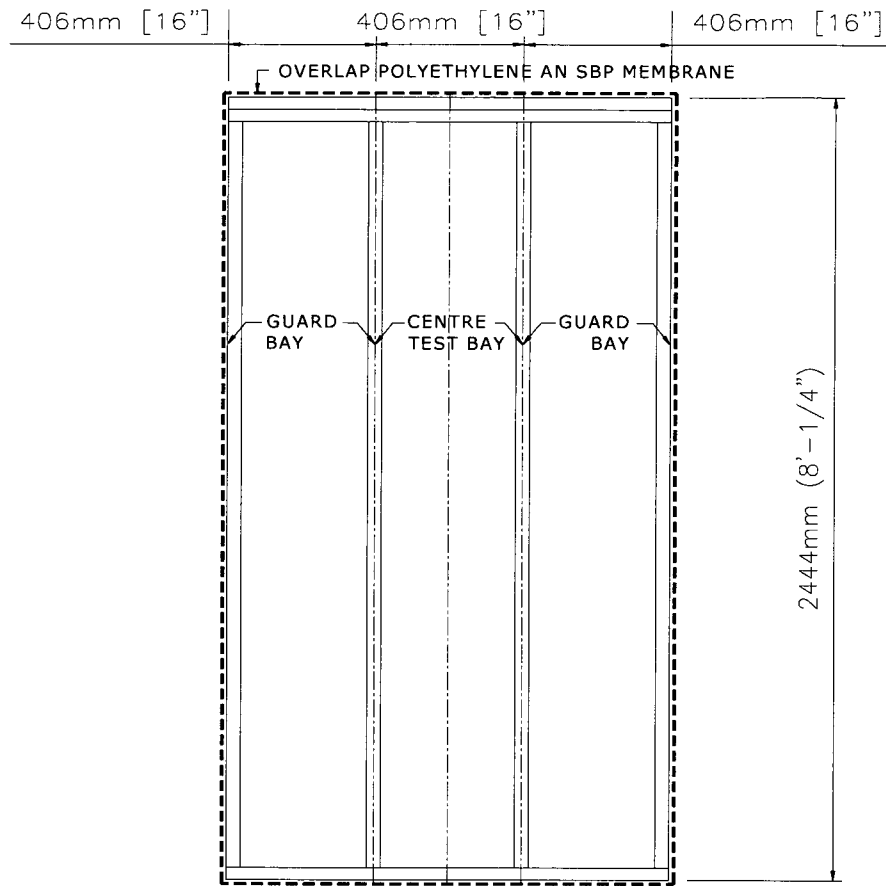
Typical test bay and guard bays of a test wall specimen.
